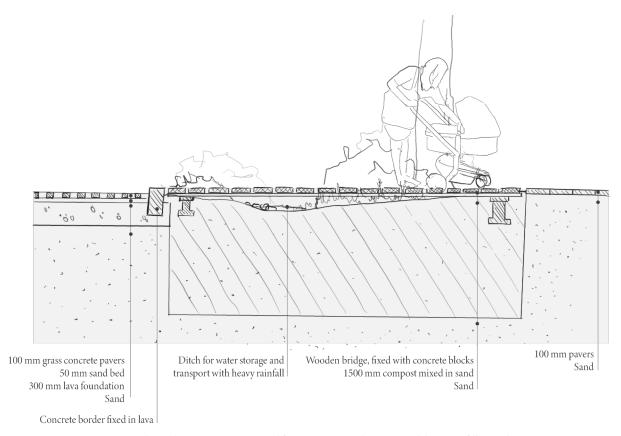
Section BB. Ditches in the green structure are used for water storage and transport with heavy rainfalls. Wooden bridges reach from the parking spots to the sidewalk.
